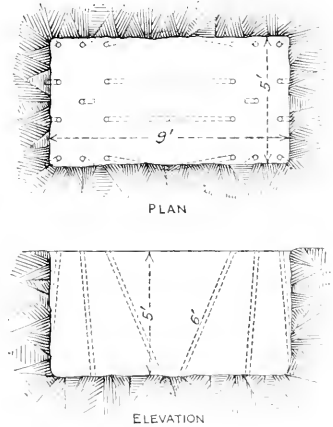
LAYOUT OF HOLES FOR SHAFT ROUND
